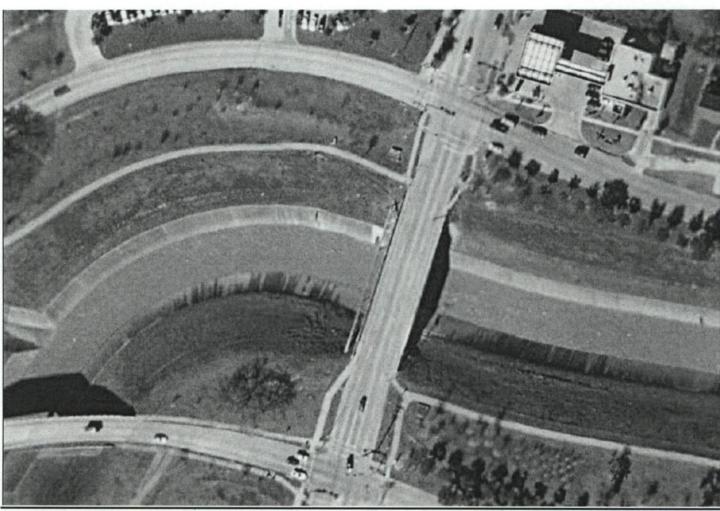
Aerial photo of Almeda Road Bridge (source: Google Earth)
